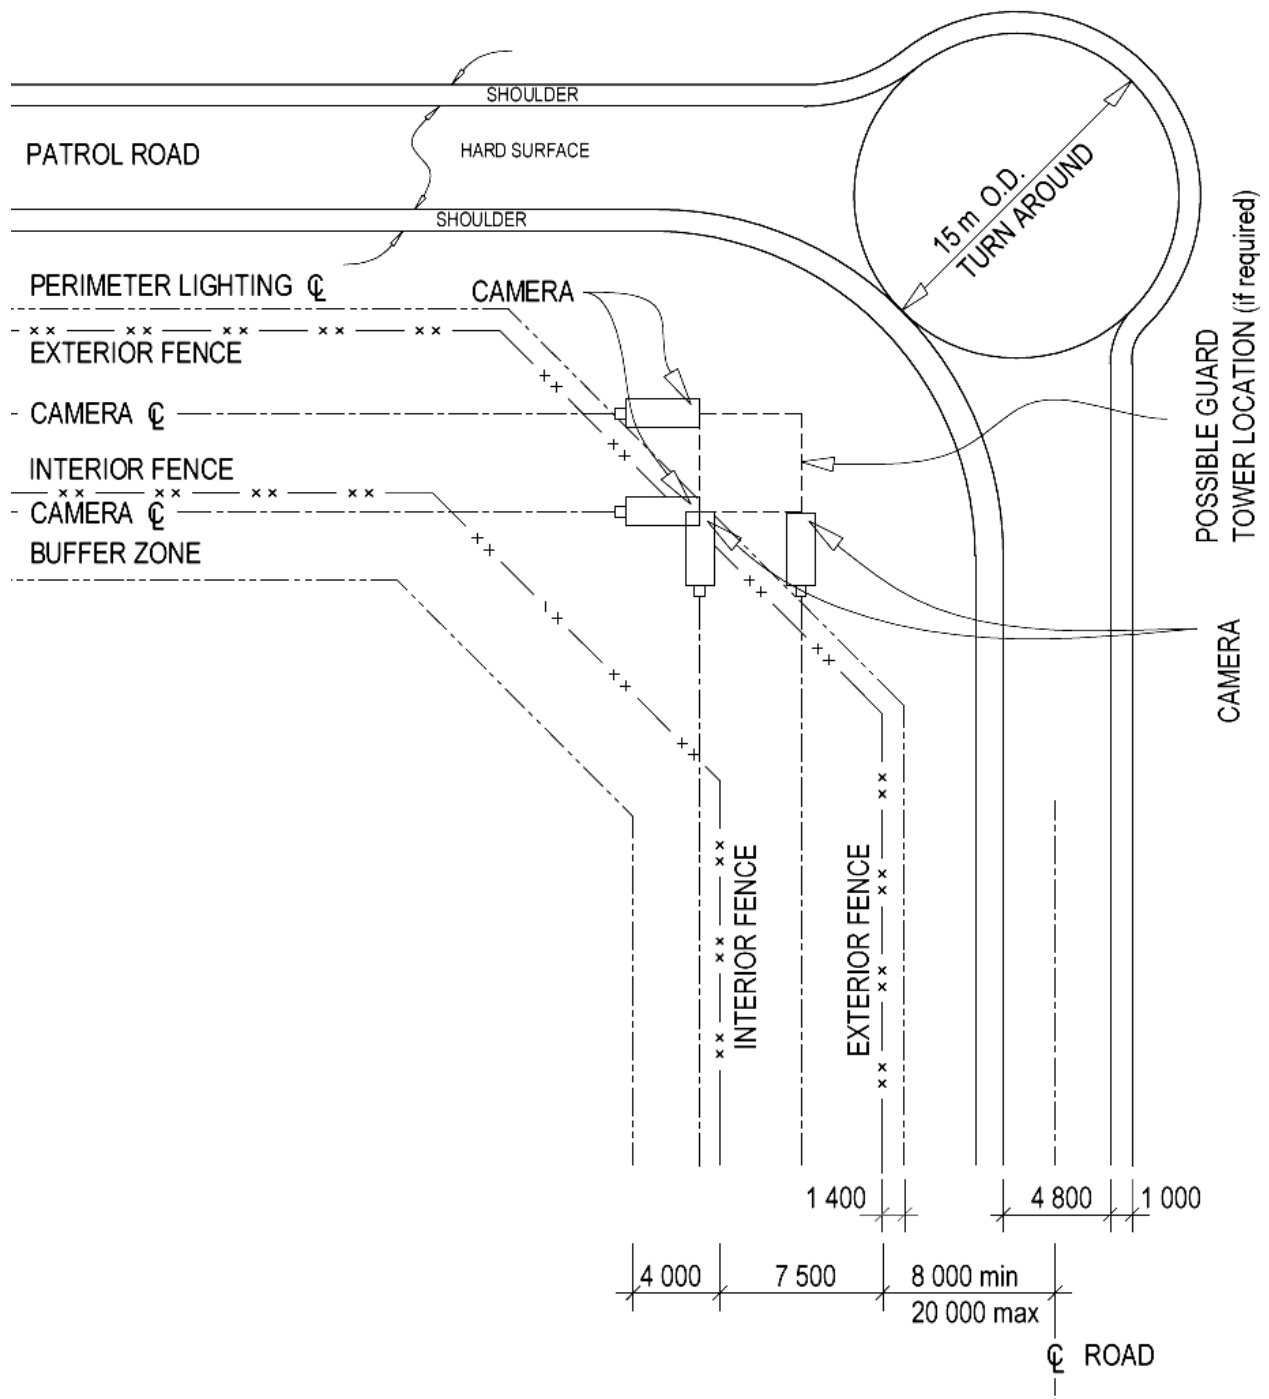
TYPICAL PERIMETER FENCE CORNER WITH TOWER
